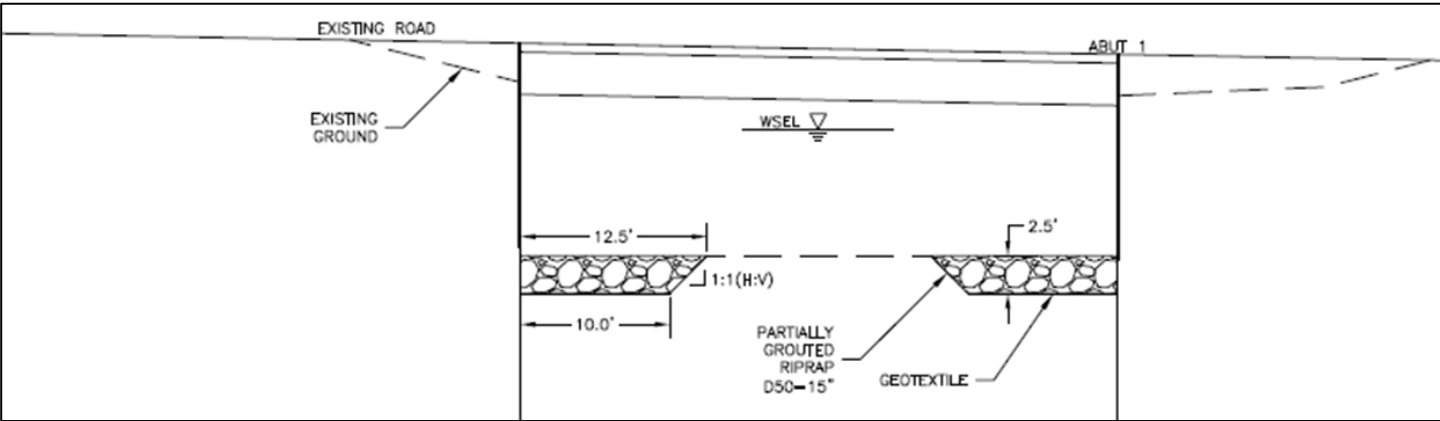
Cross-sectional view of Bridge H-25-M with recommended hydraulic scour countermeasures
